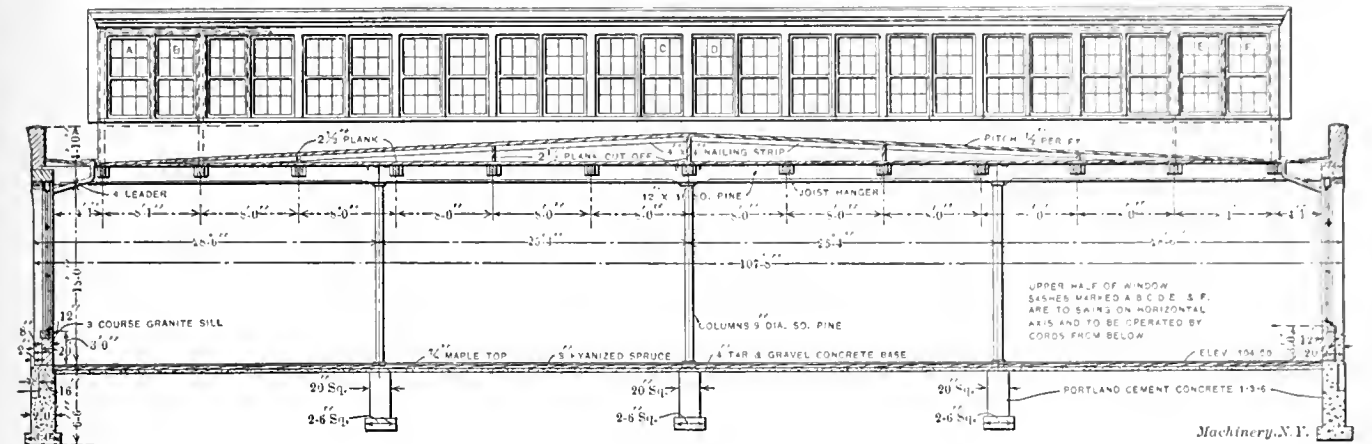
Section through Building having Vertical Saw-tooth Roof
